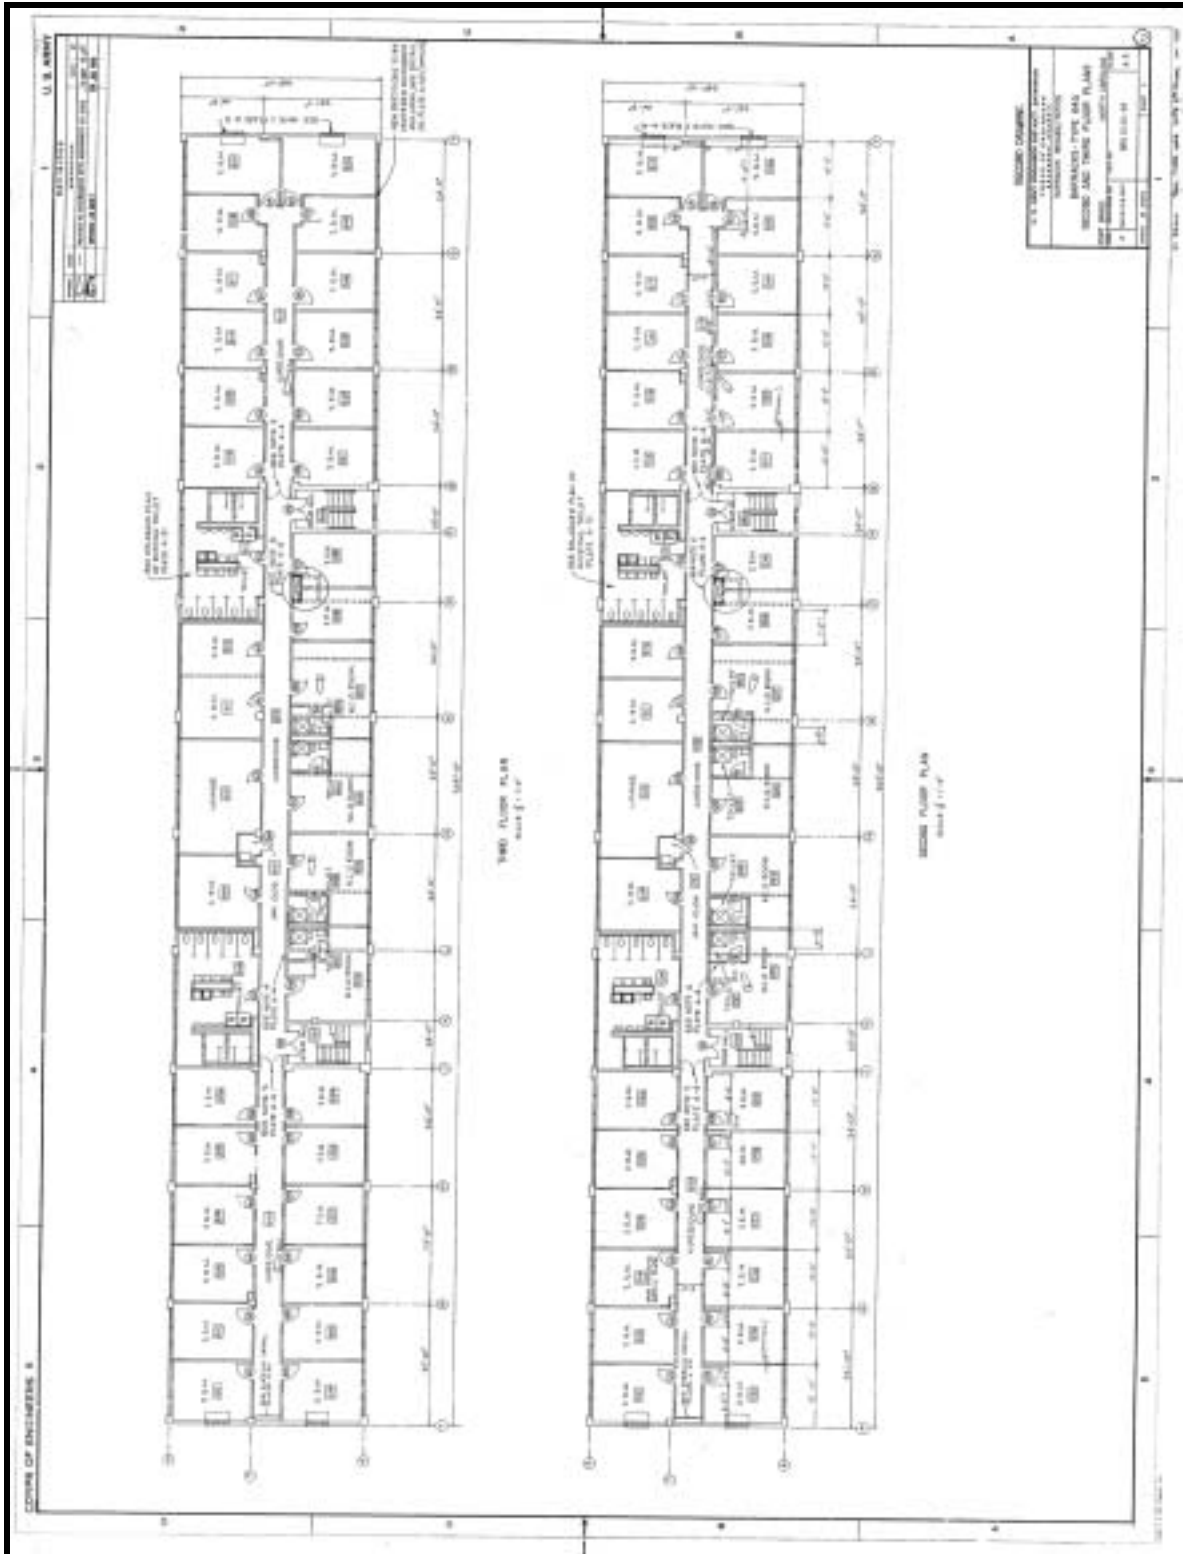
Renovated hammerhead barracks, second and third floor plans, barracks wing (1972, revised 1974) (Engineering, Ft. Bragg).
